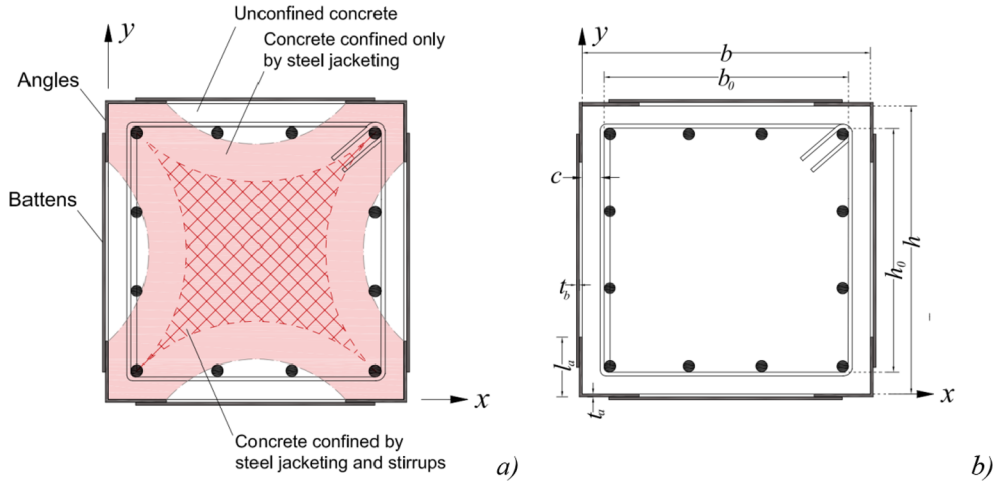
Configuration of the cross-section of a column reinforced by steel jacking: (a) effectively confined area by stirrups and steel jacking; (b) geometric arrangement.
